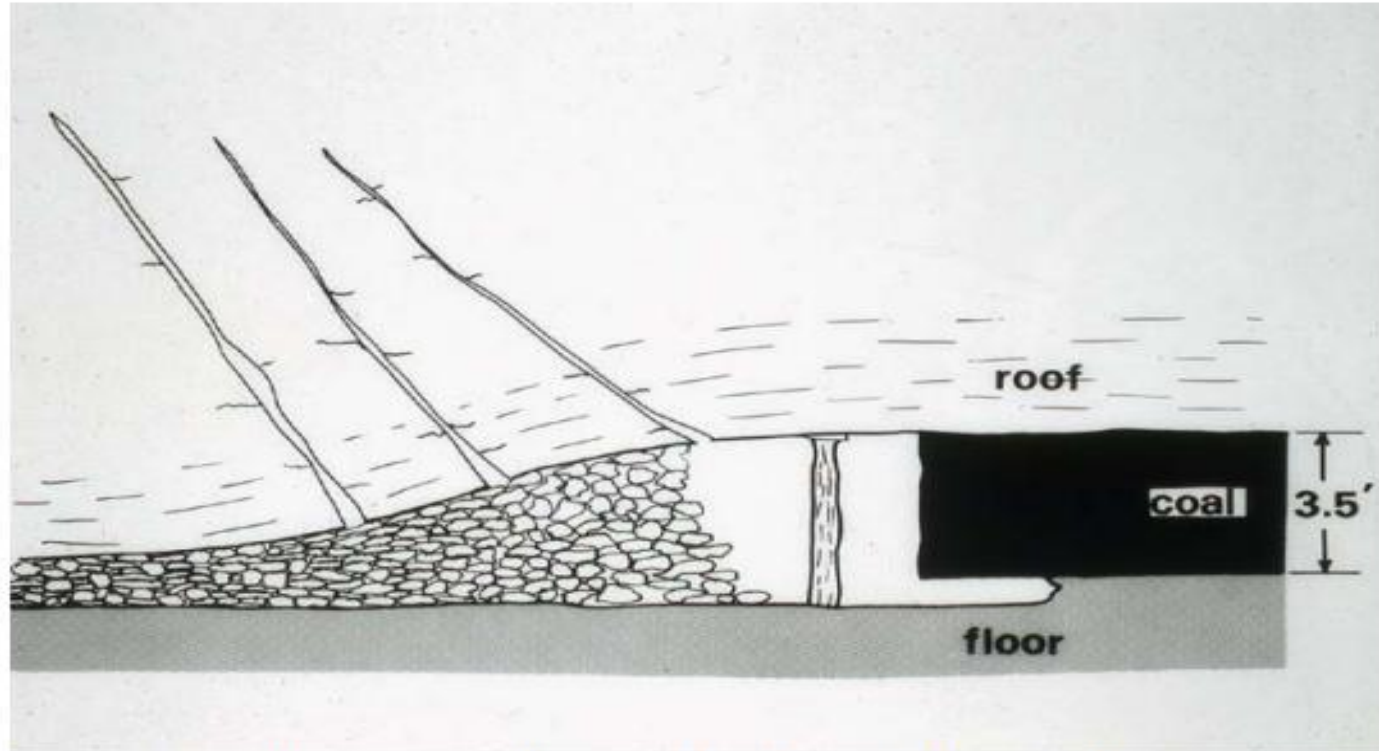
Cross section diagrams at the outside edge of a longwall. Cross section from mine working face at right with undercutting and condition behind working face, back toward the mine shaft (Bauer 1984).
